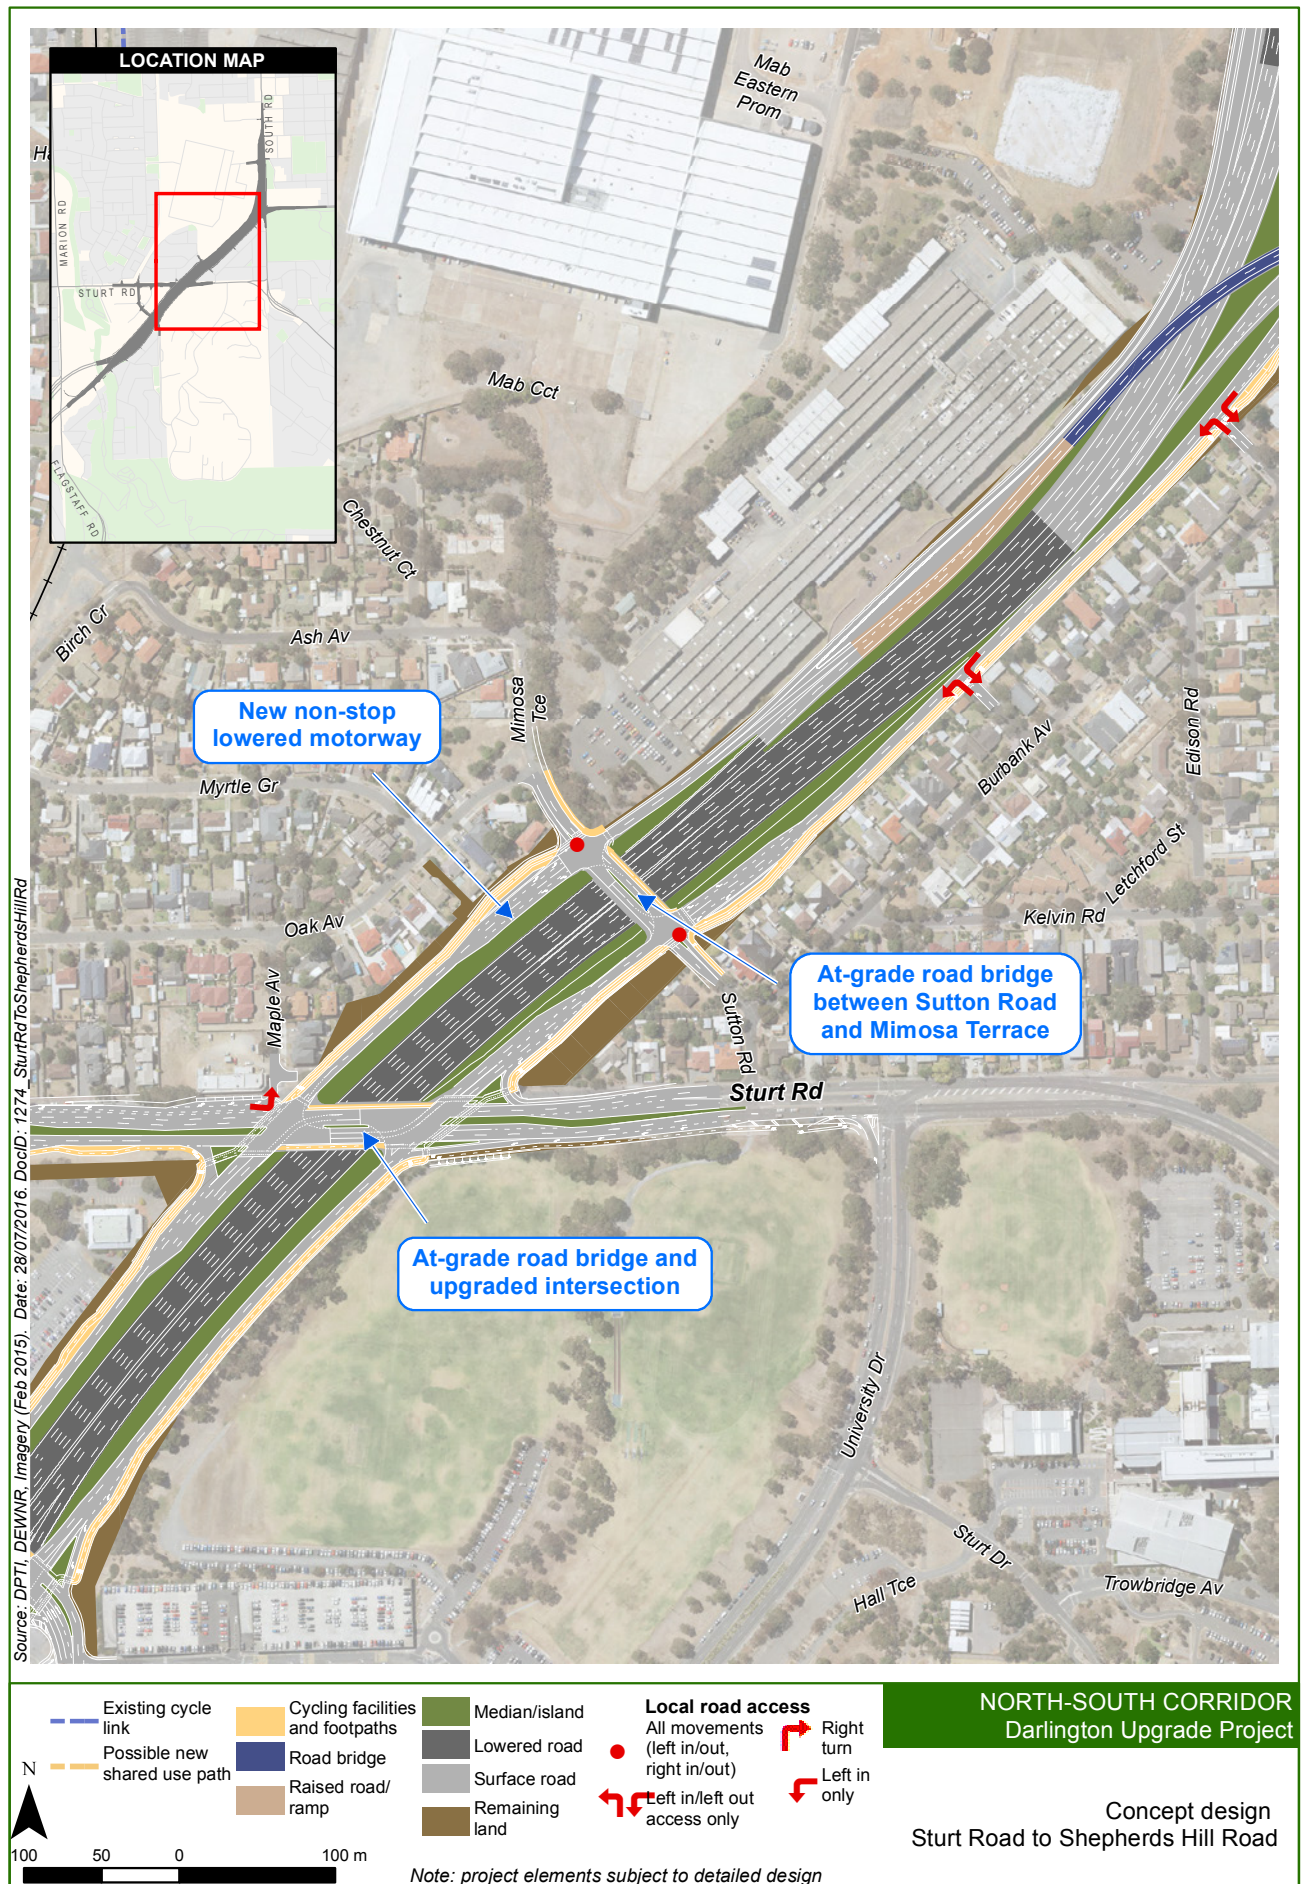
Darlington Upgrade Project – Sturt Road to Shepherds Hill Road
